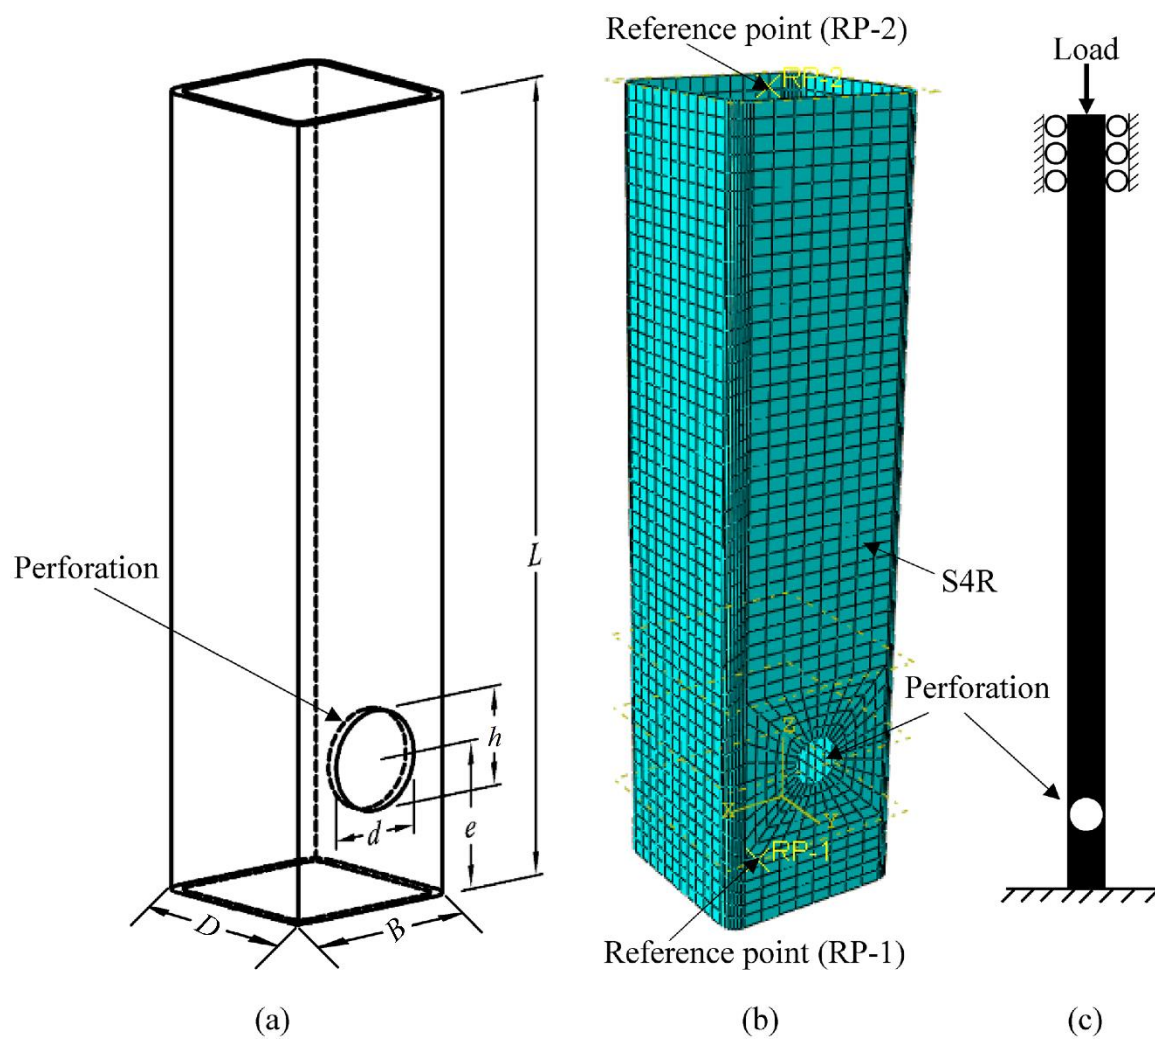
Typical (a) geometry (b) FE Model and (c) boundary and loading conditions of a single side perforated stub column.
